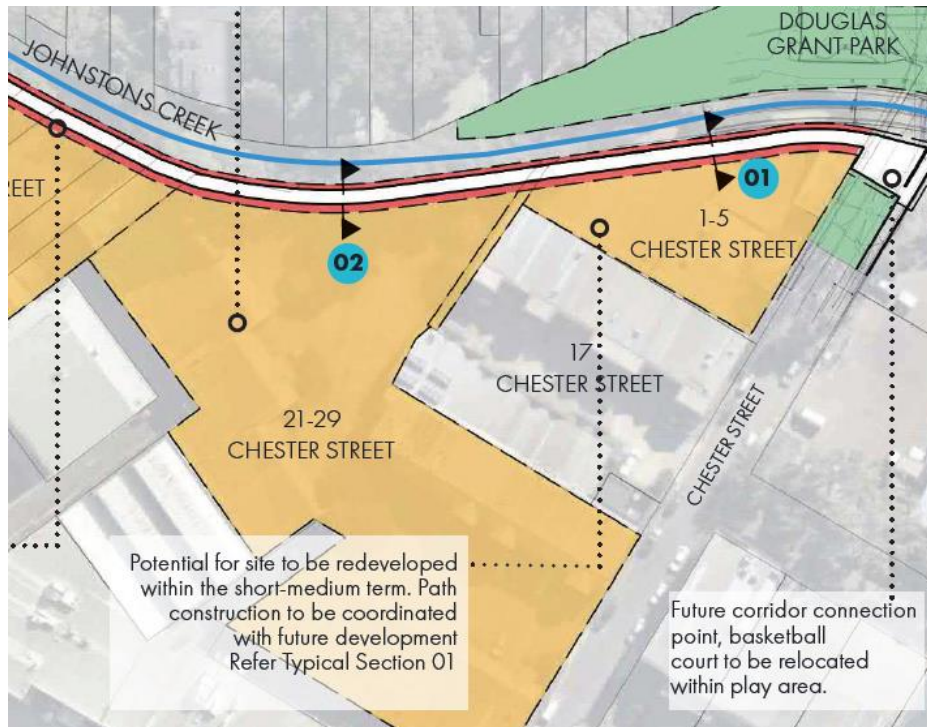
Zone 1 of the Johnstons Creek master plan (to be delivered by Council) (source: Leichhardt and Camperdown Precincts Public Domain Master Plan)
